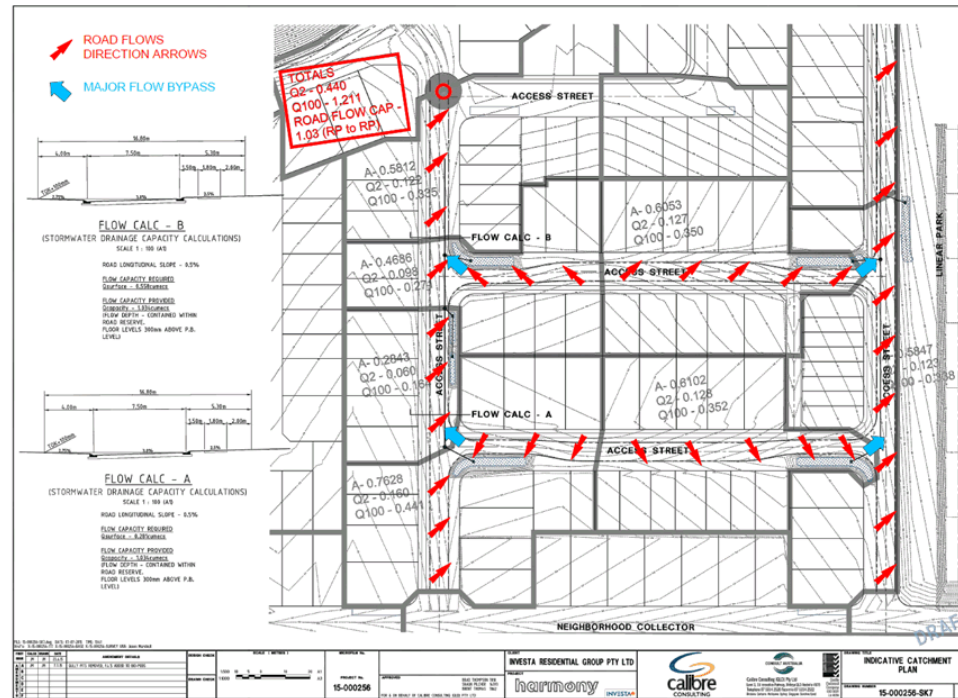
Sample Layout and Drainage Calculations by Calibre Consulting
